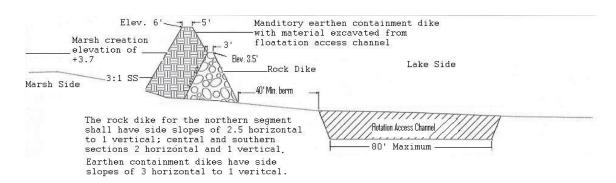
Typical Cross Section of Earthen Containment Dikes and Rock Dikes
